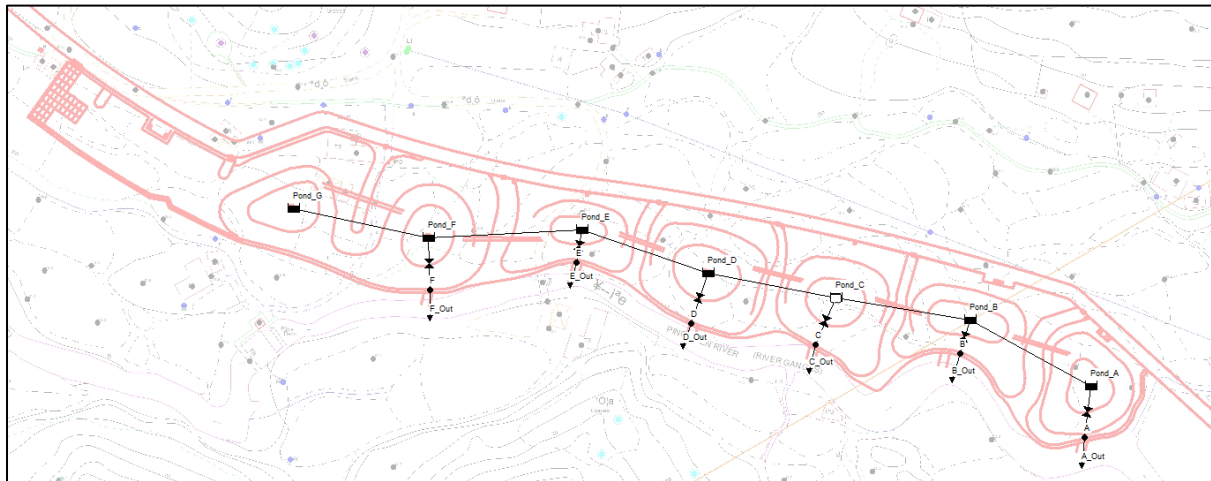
Layout of Inter-connecting Ponds and SWMM Model Setup
